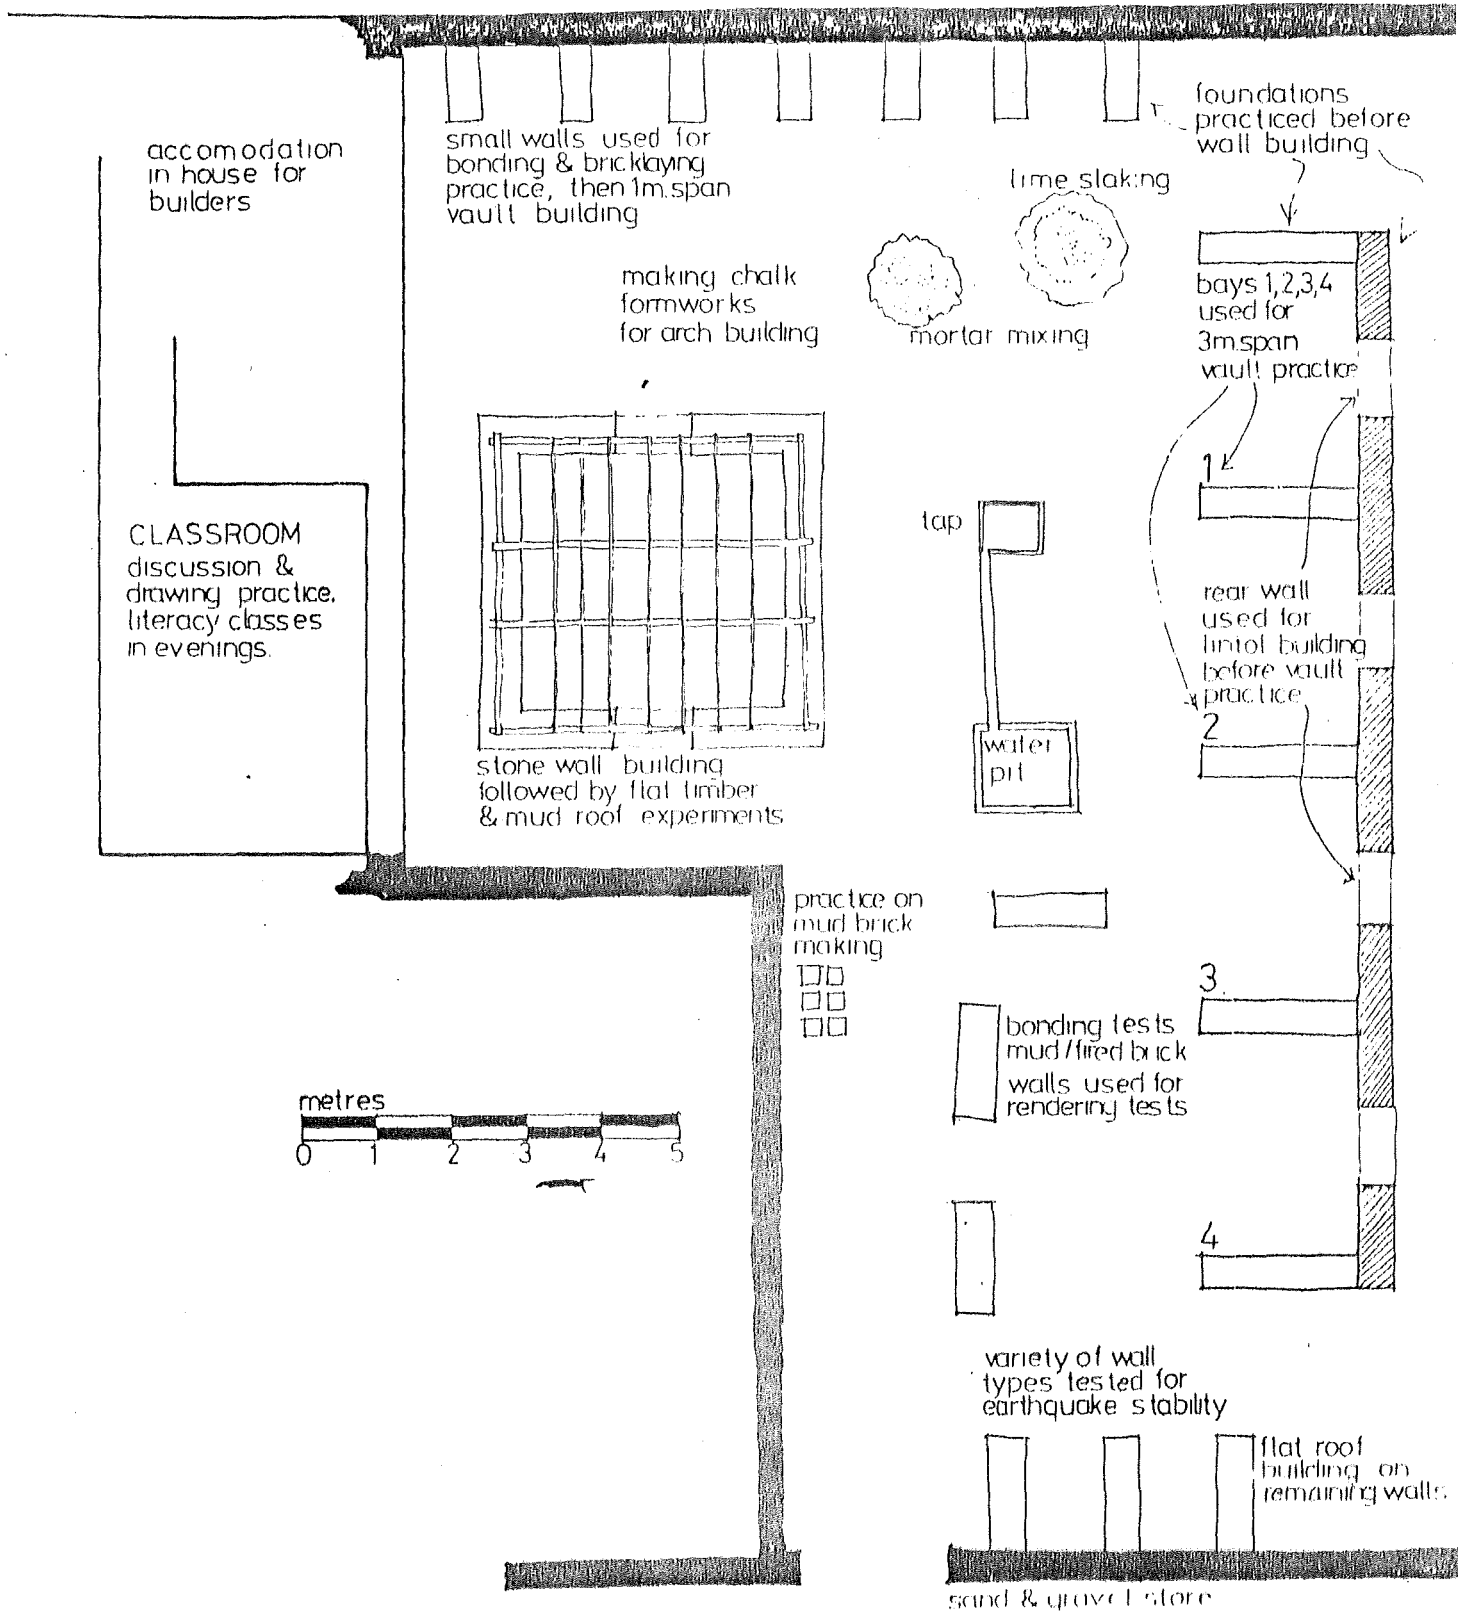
LAYOUT OF BUILDERS' WORKSHOP
